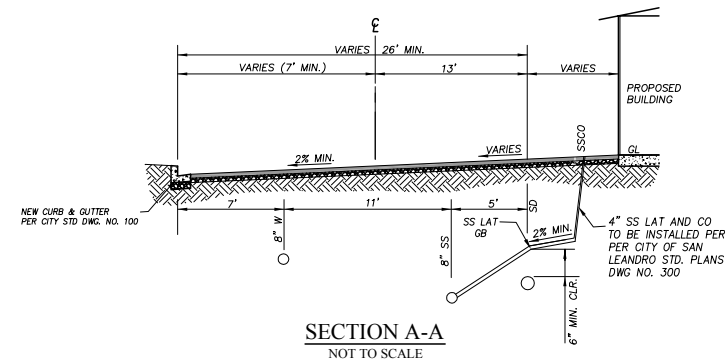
GRADING AND UTILITY PLAN SOUTH
